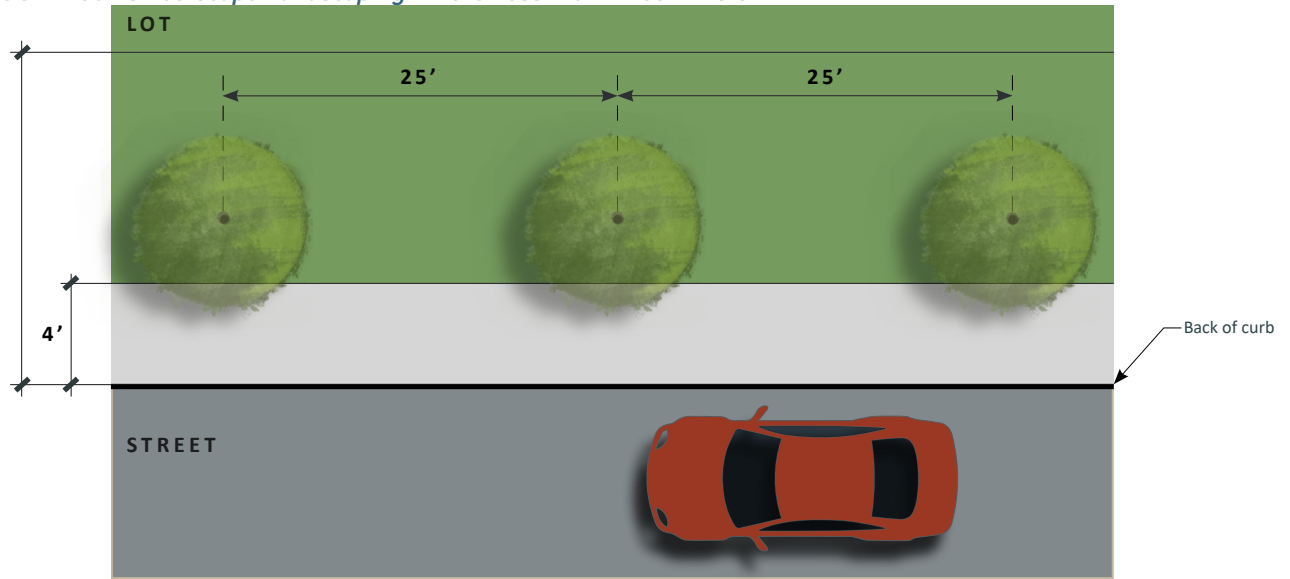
Streetscape Landscaping Where Less than 4 Feet Exists
